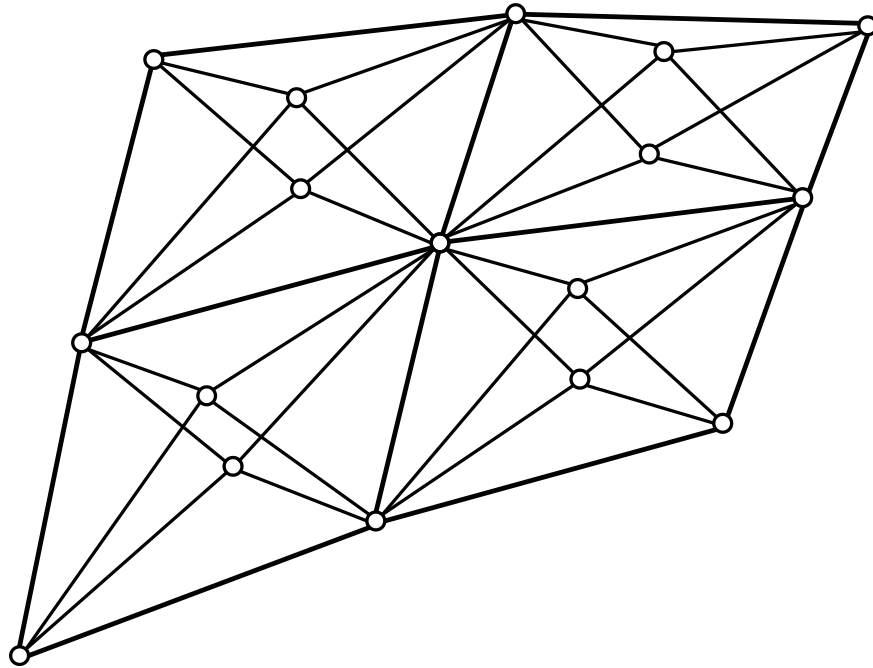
Tension stabilized truss structure: Adapted from Kawaguchi *et al.* (1996).
